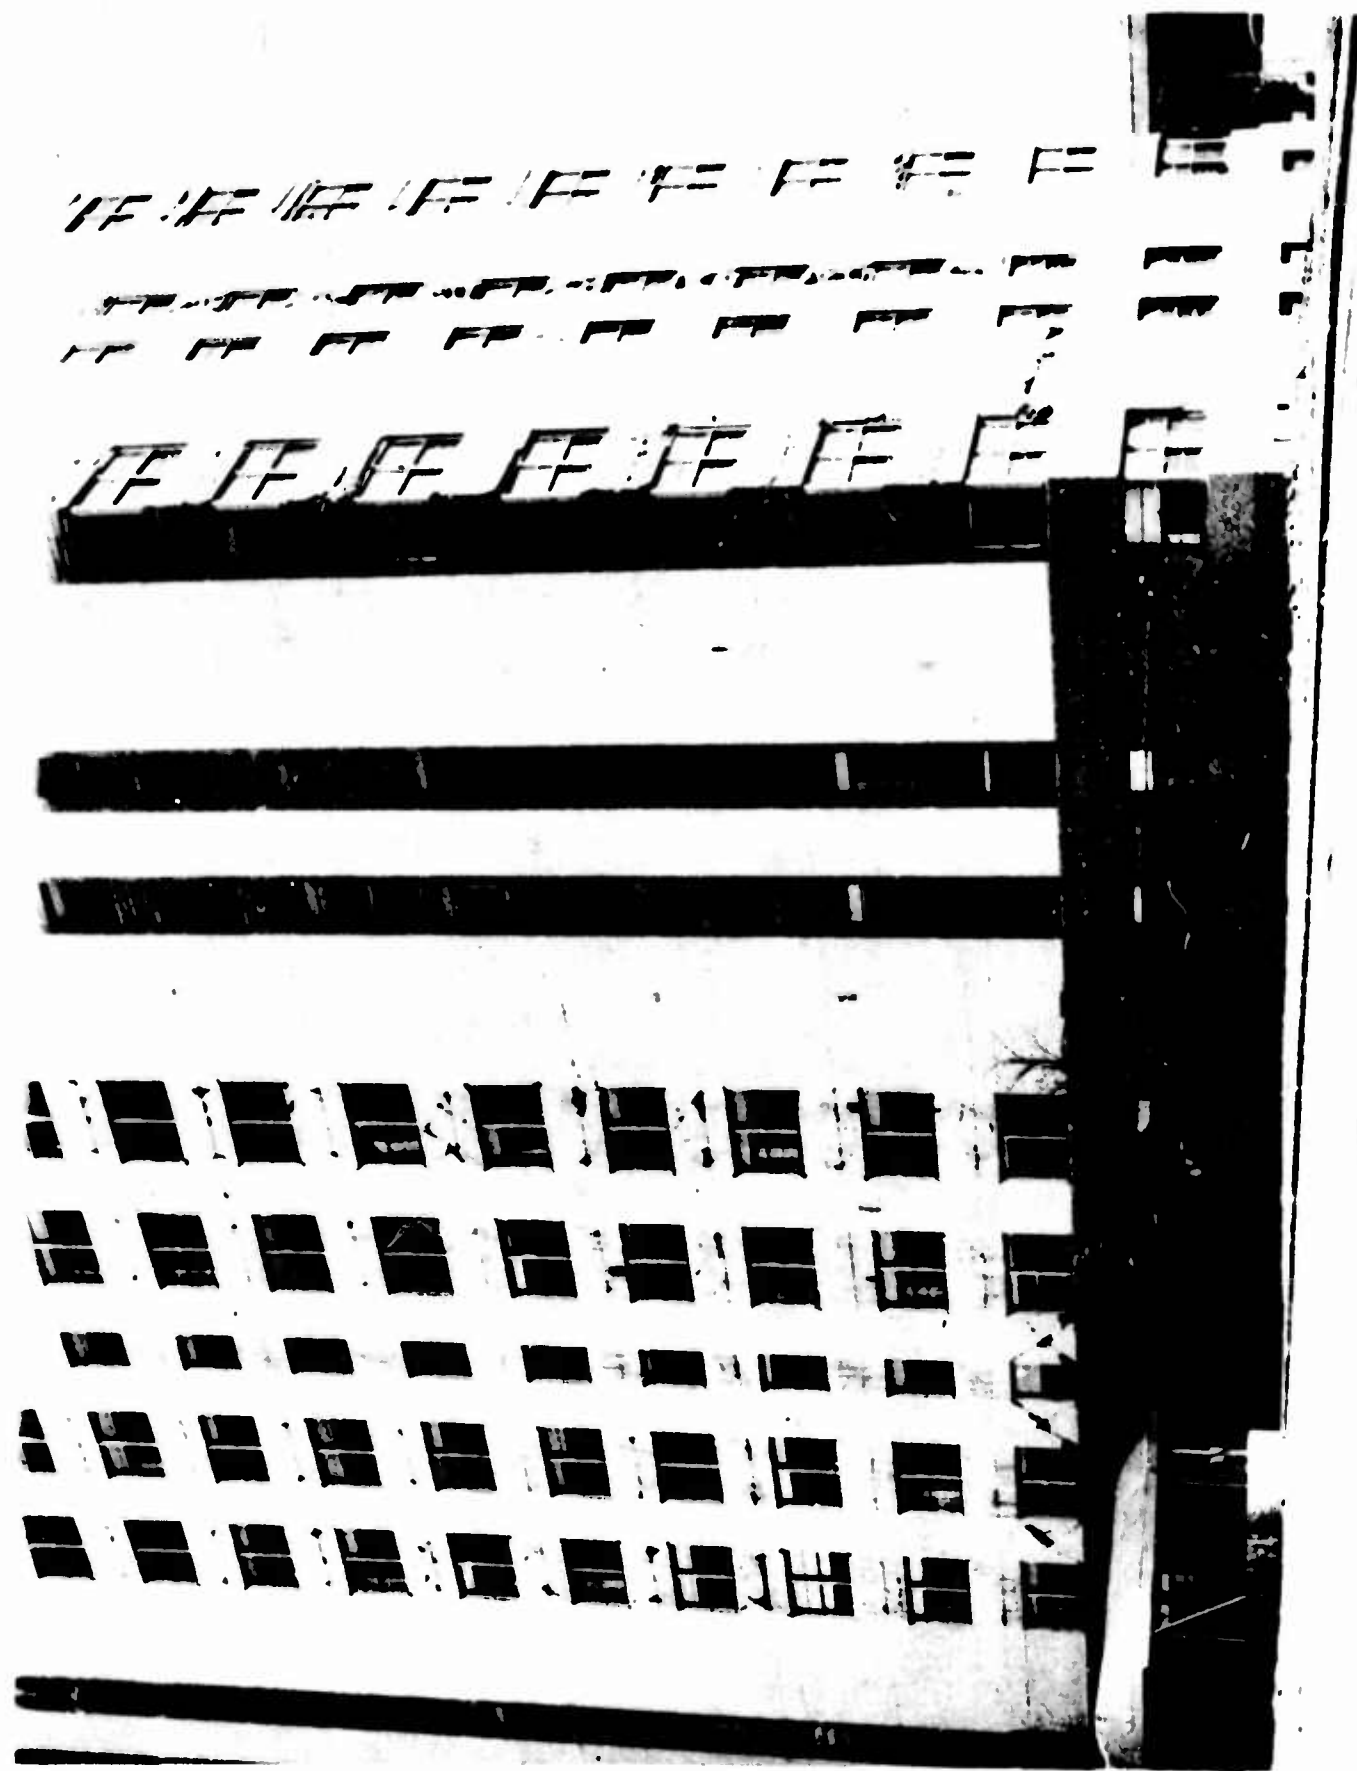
Twelve-Hundred L Street Apartments (West wall of structure showing absence of major diagonal tension failures at second-floor level which occurred in the Mount McKinley Building)
